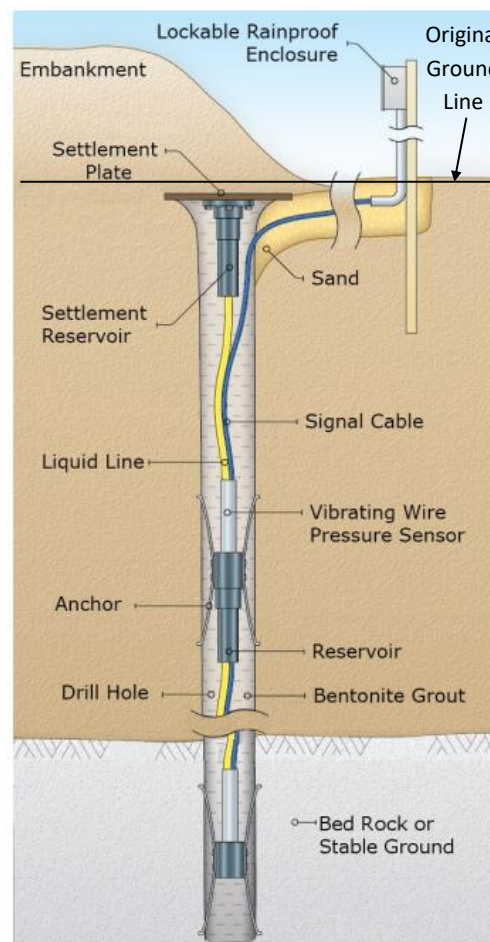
Typical Vibrating Wire Settlement System
